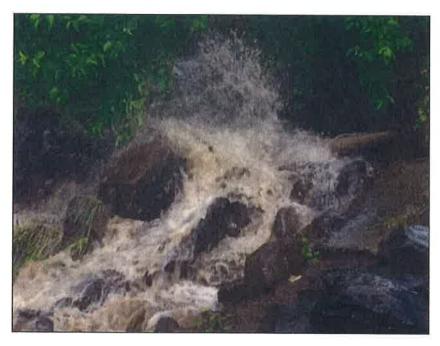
Channel conveying Boones Ferry Road drainage across the Lucini property.
